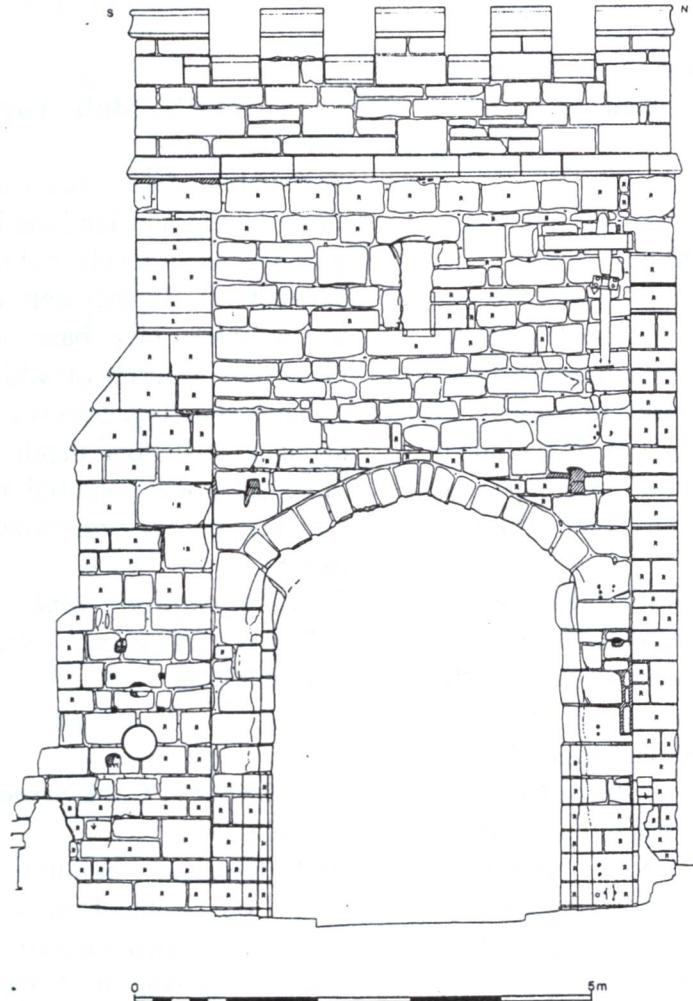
Coventry, Cook Street Gate, Inward-facing elevation
